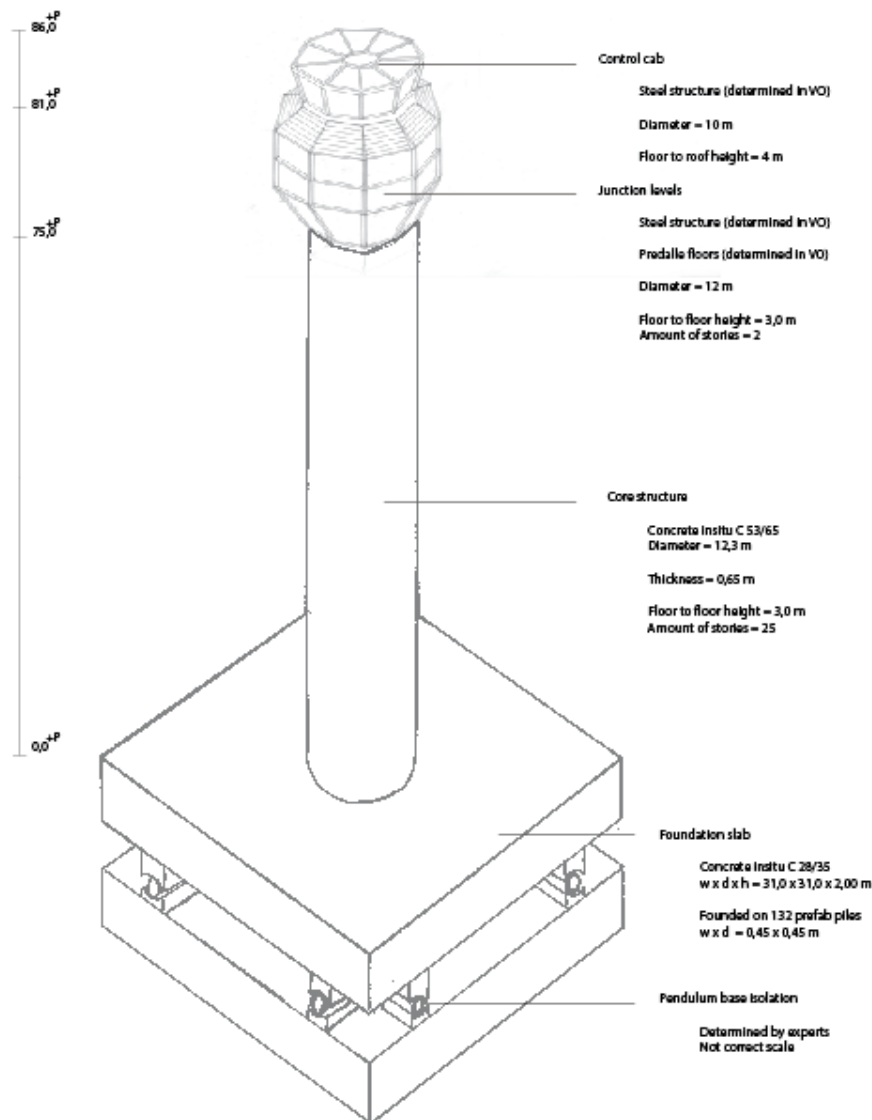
Concept design Tokyo airport, concrete core in-situ
